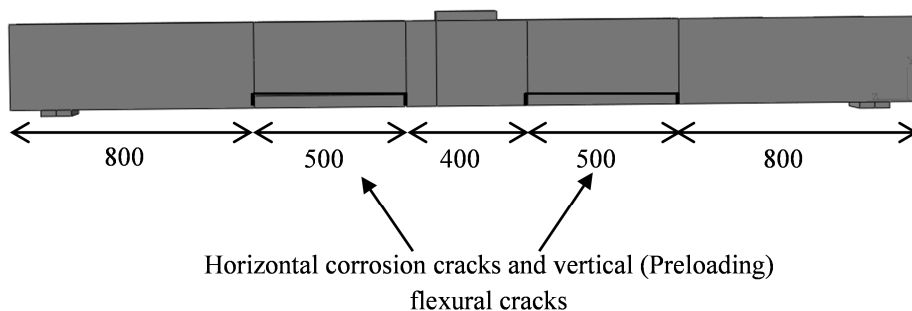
Cracks created at concrete cover plane of corroded beam in (mm)
